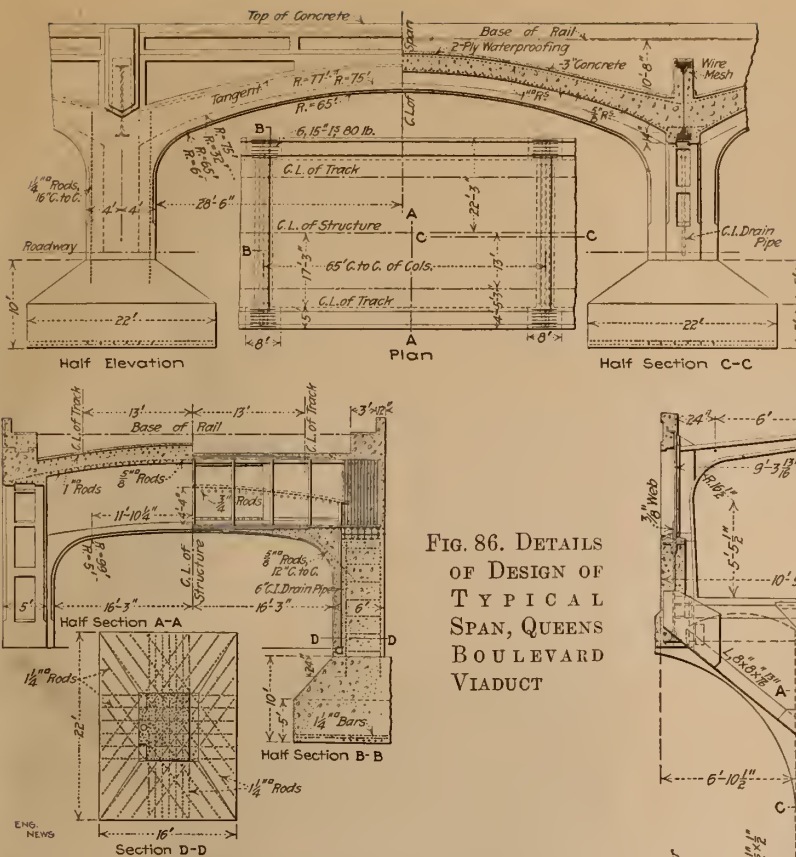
DETAILS OF DESIGN OF TYPICAL SPAN, QUEENS BOULEVARD VIADUCT
